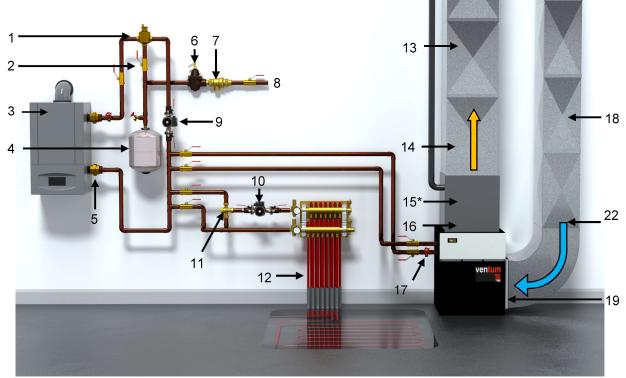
Typical installation of a hydronic air-handler unit with boiler and radiant heating
